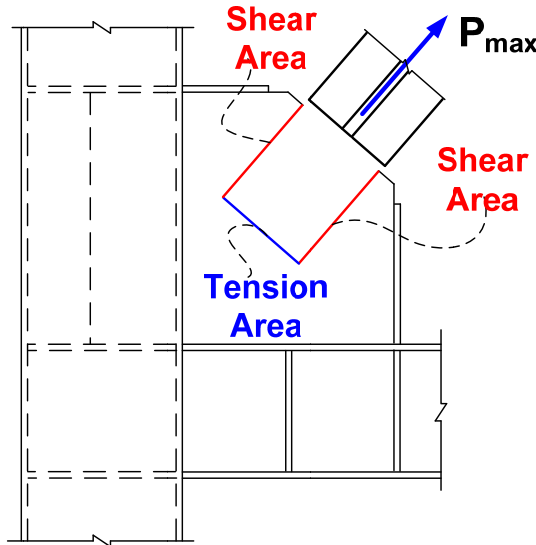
The block shear failure of the BRB end-to-gusset connection.
